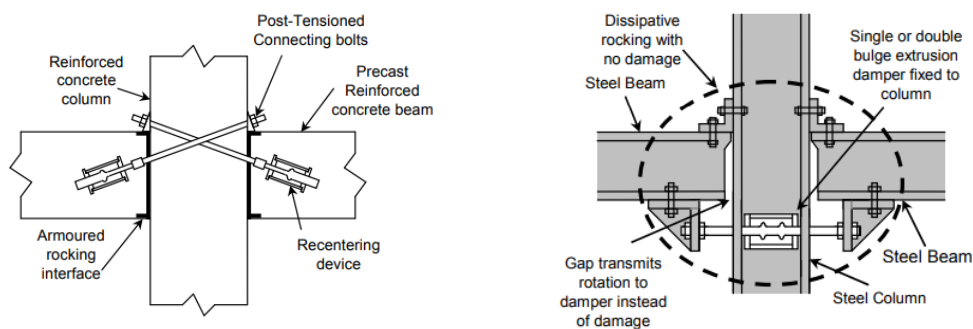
Left – Schematic of implementation in precast concrete connection, Right – Schematic of application to steel beam column joint.
